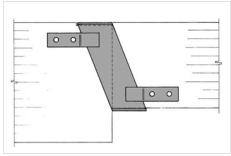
A—TYPICAL INSTALLATION OF A THC HANGER
